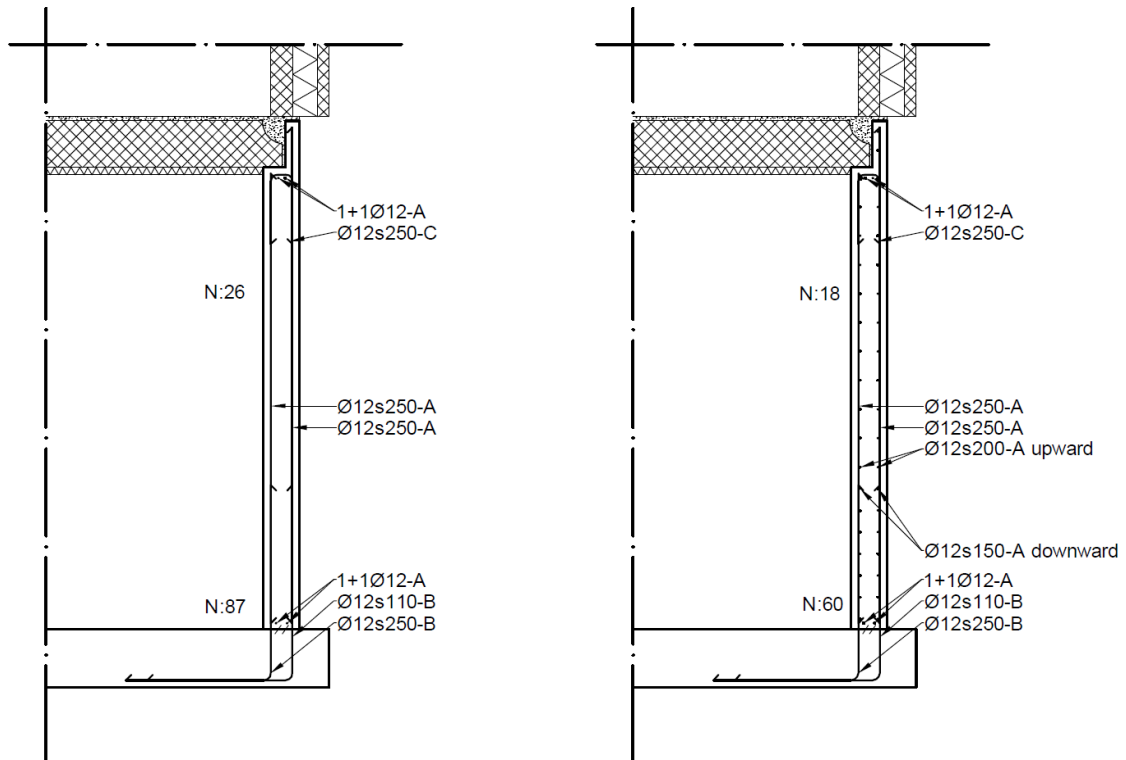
Wall reinforcement with regard to requirements in ULS (left) and SLS (right).
